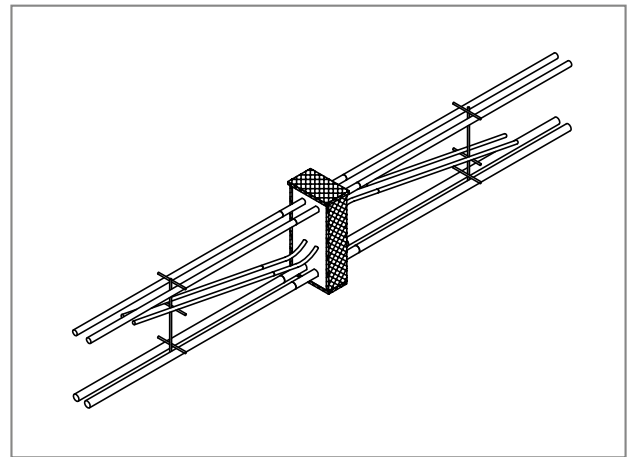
Schöck Isokorb® T type B: Perimeter fire protection boards
